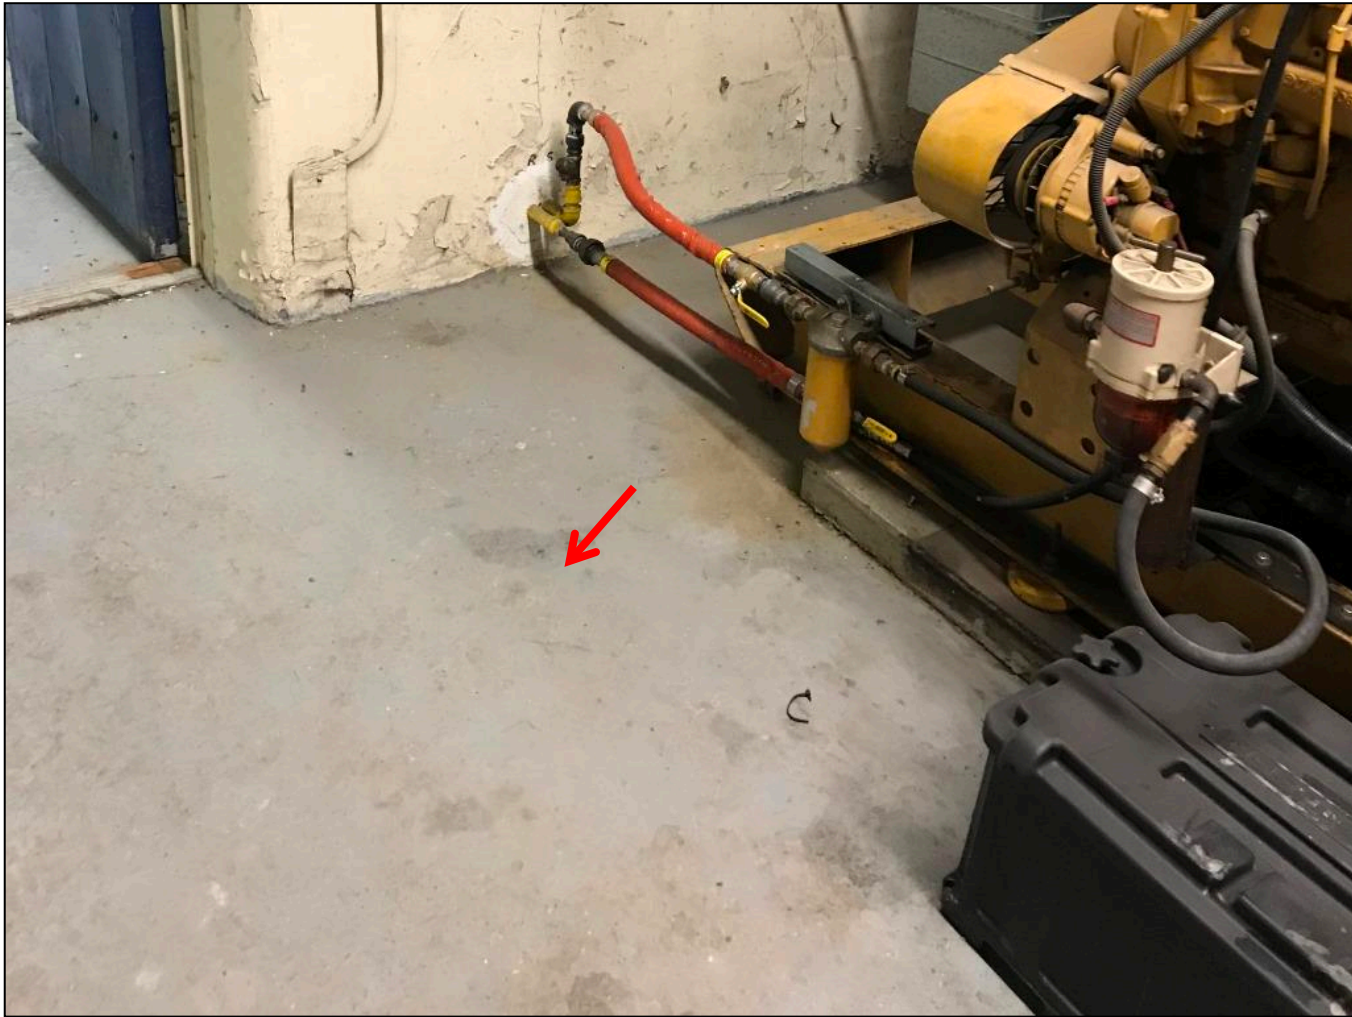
Main Floor, Room 112 – Grey Paint (Low Lead Containing)
